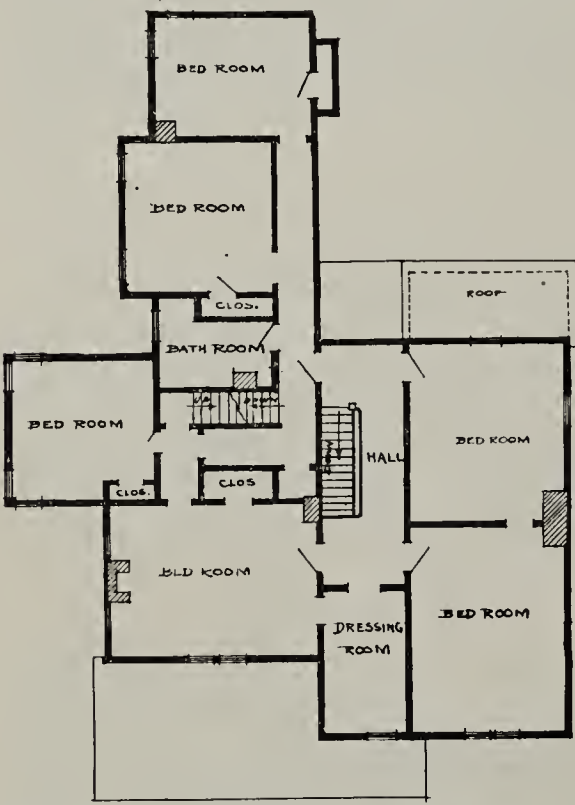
Lymanhurst, second-floor plan, before alterations.
